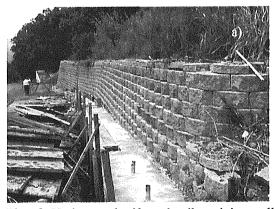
Damage to reinforced-soil retaining wall using keystones as a facing (along District Road No. 129; site 2 in Fig. 1)
